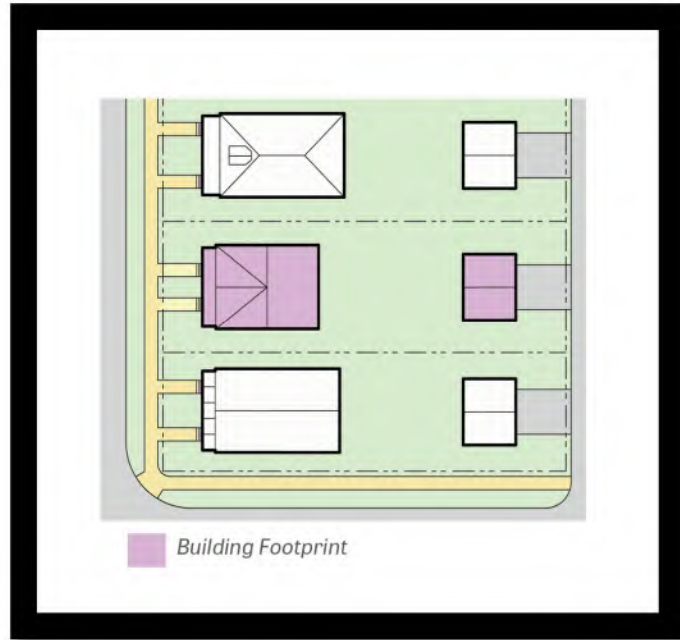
Graphic showing building footprint (all area in pink) as the measure of the area underneath the building, typically equal to the area of the ground floor.
